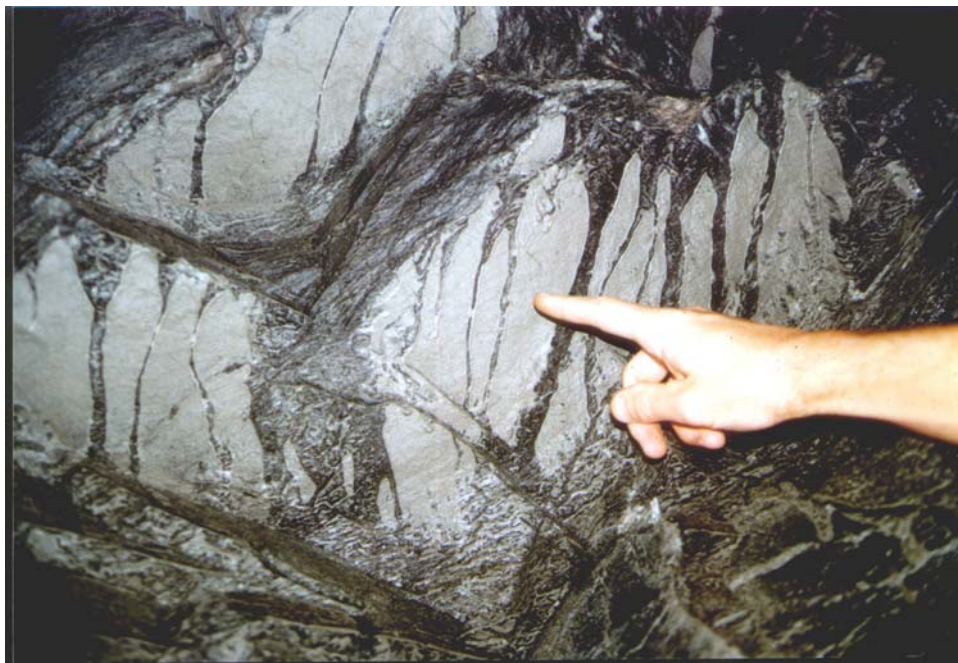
A example of two joint planes which have been grouted. The bright areas are grout and the dark areas are rock mass.
